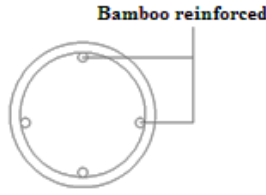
Bamboo reinforced position in composite pile reinforcement
